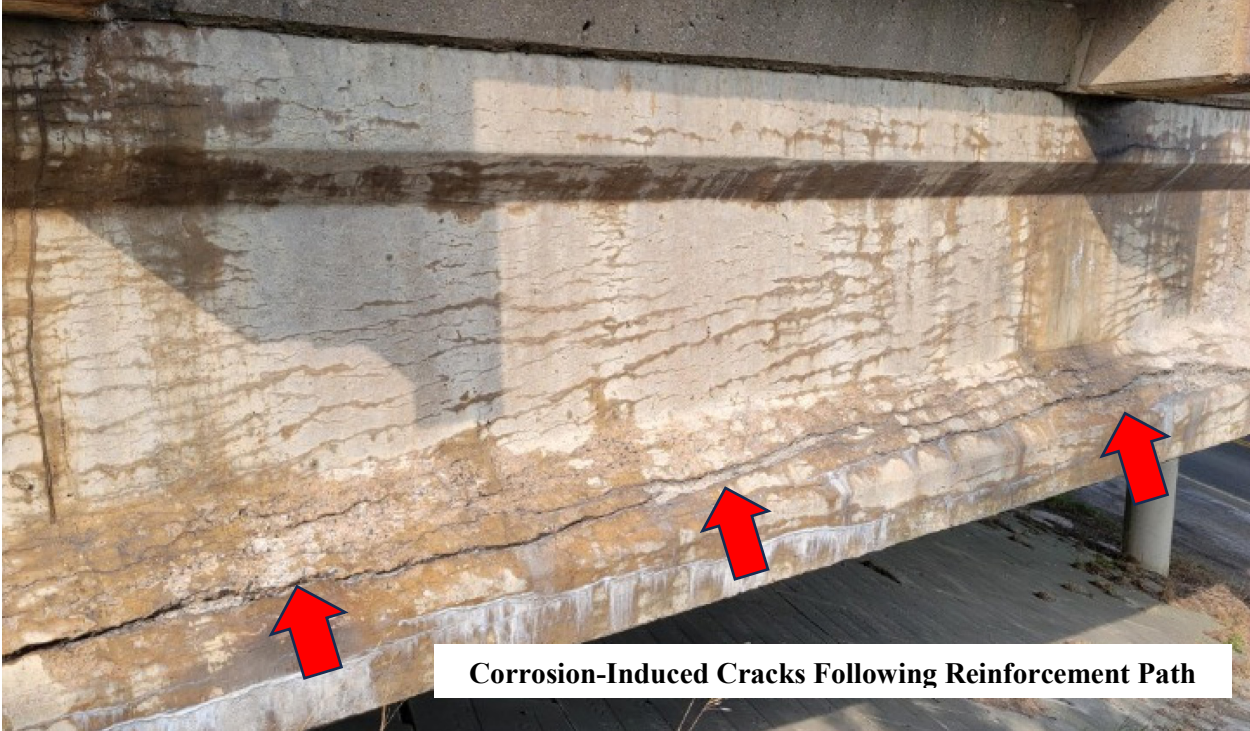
Corrosion-induced cracks on a prestressed bridge girder, NS
